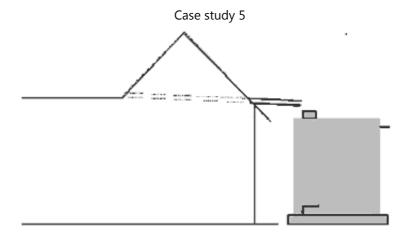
Pipe has to pass through roof, from central roof courtyard, to tank
